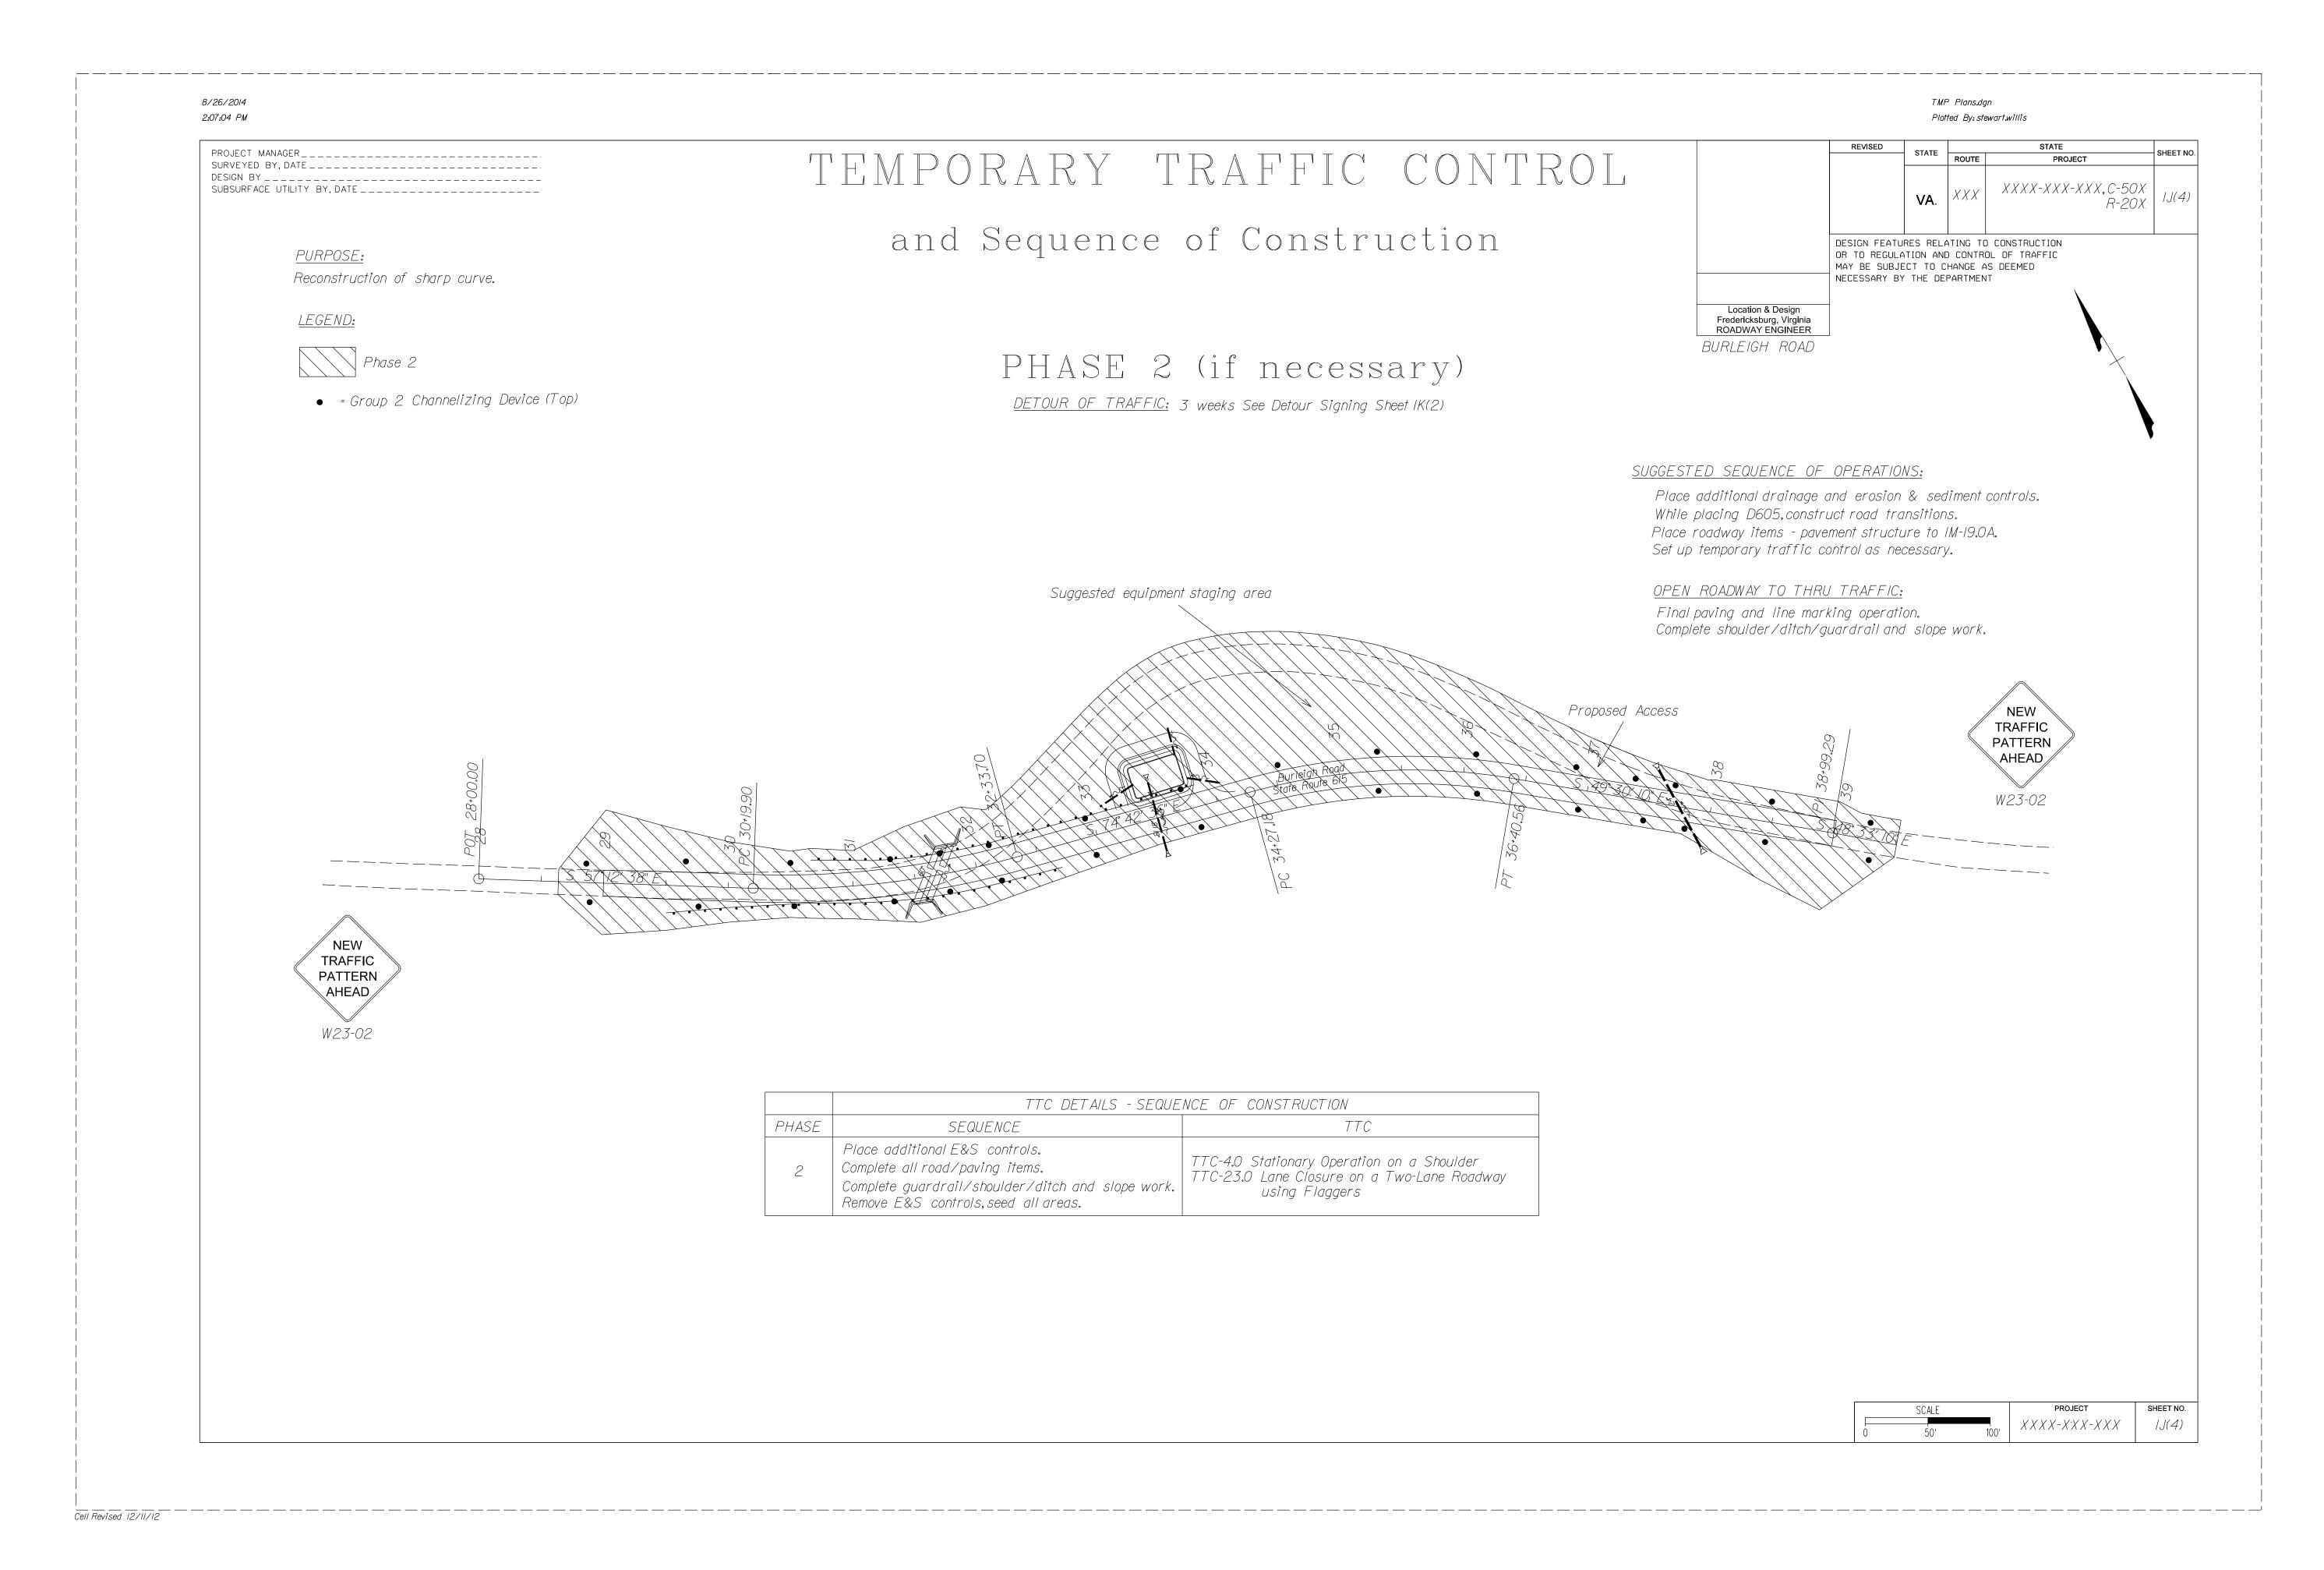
H - 14 SAMPLE TRAFFIC MAINTENANCE PLAN (TMP) SHEET
